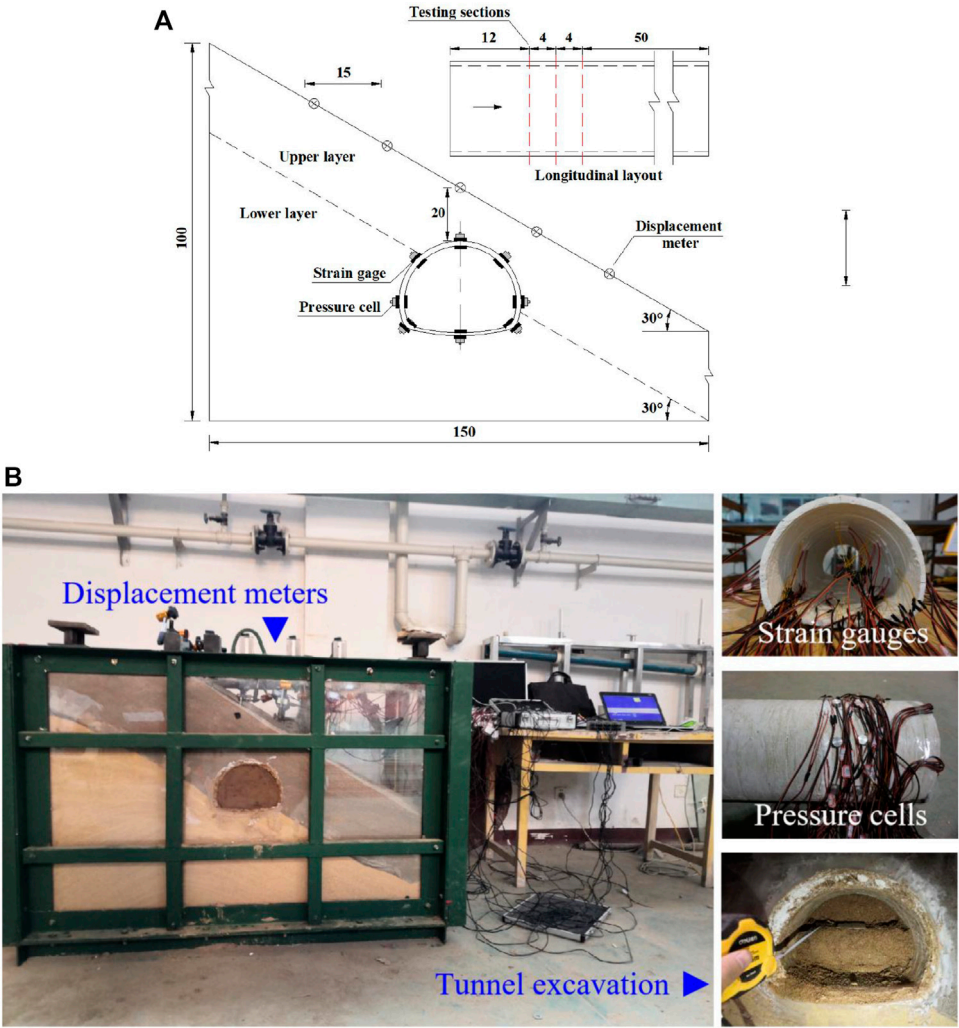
Model tests: (A) Cross-section layout of test elements and (B) Photographs of model tests.
